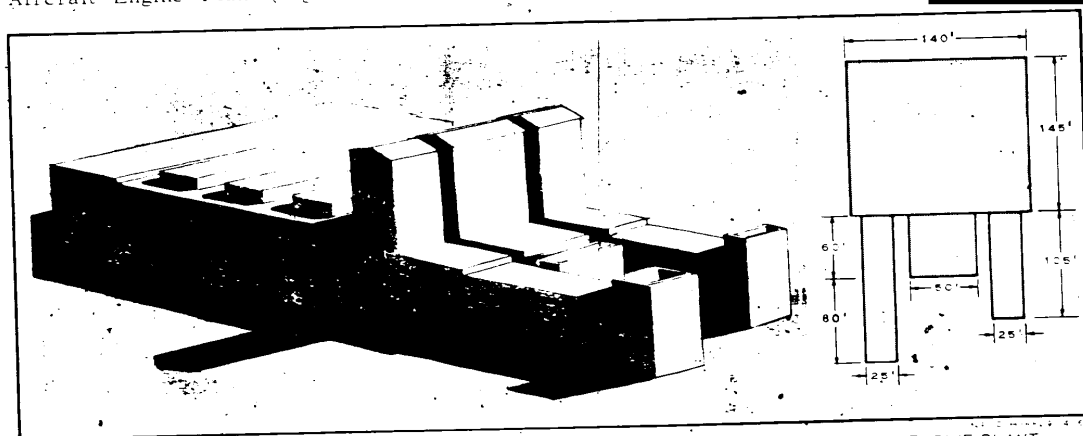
PLAN AND PERSPECTIVE VIEWS OF ENGINE TEST BUILDING, CHU-CHOU AIRCRAFT ENGINE PLANT.
